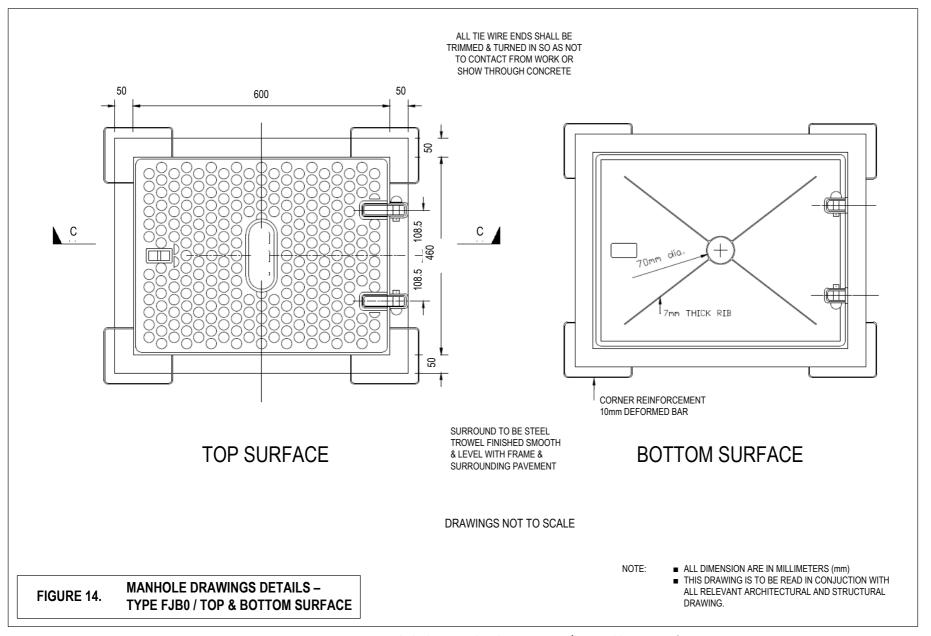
Manhole drawings details - Type FJB0 / Top and bottom surface
